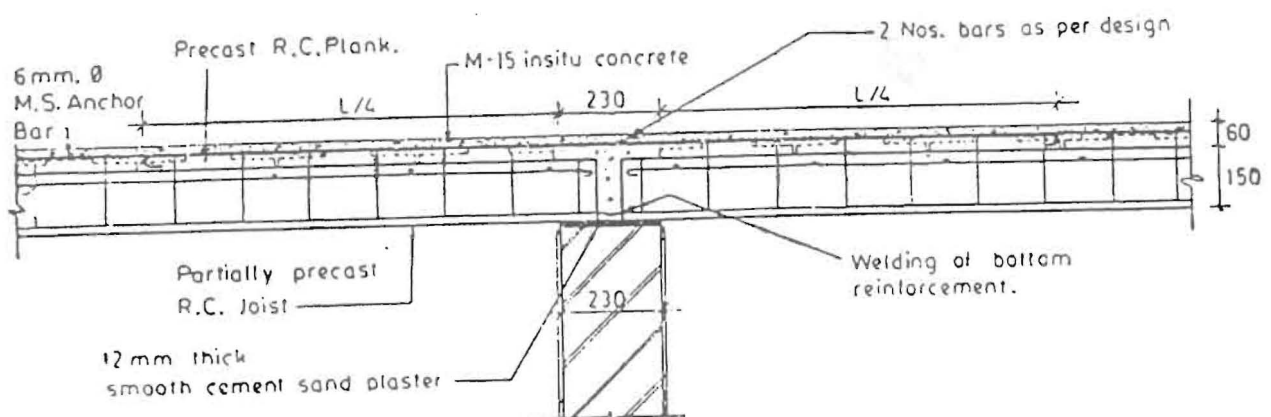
(c) : DETAIL FOR CONTINUITY OF JOIST AT SUPPORT IN INTERMEDIATE FLOORS
